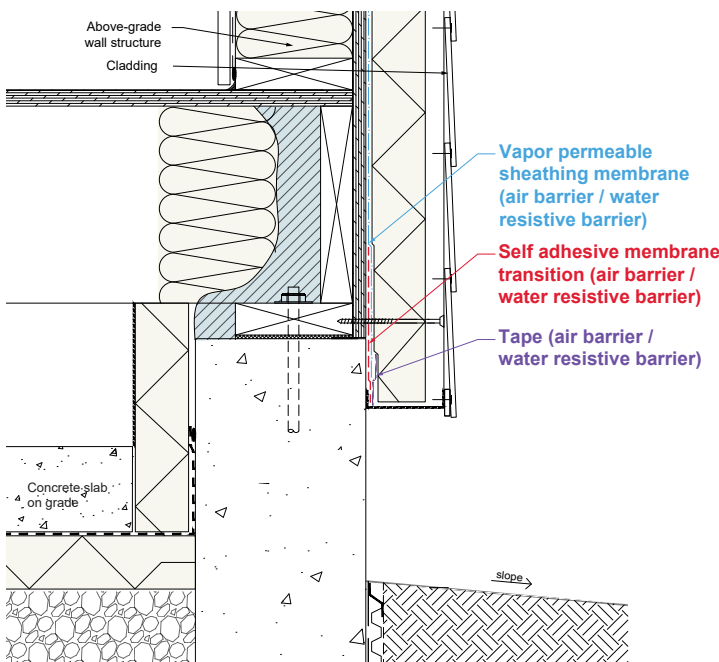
Example of air barrier continuity at a transition between the foundation and above-grade wall assembly
